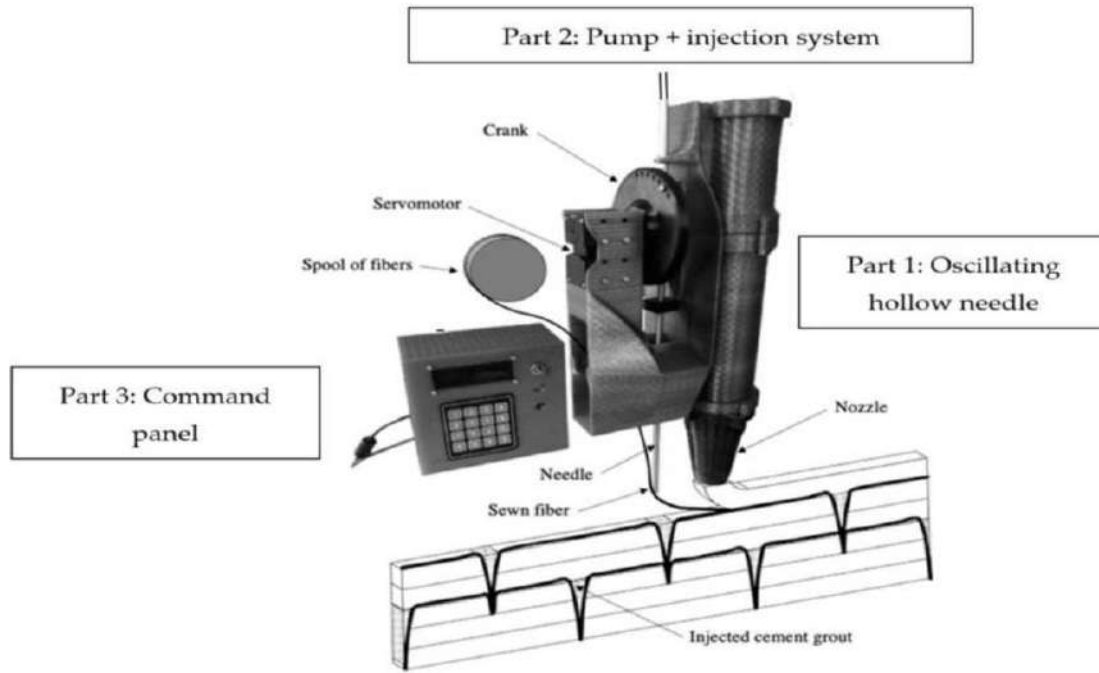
Sewing technique for vertical reinforcement of 3D printed concrete layers [11]
